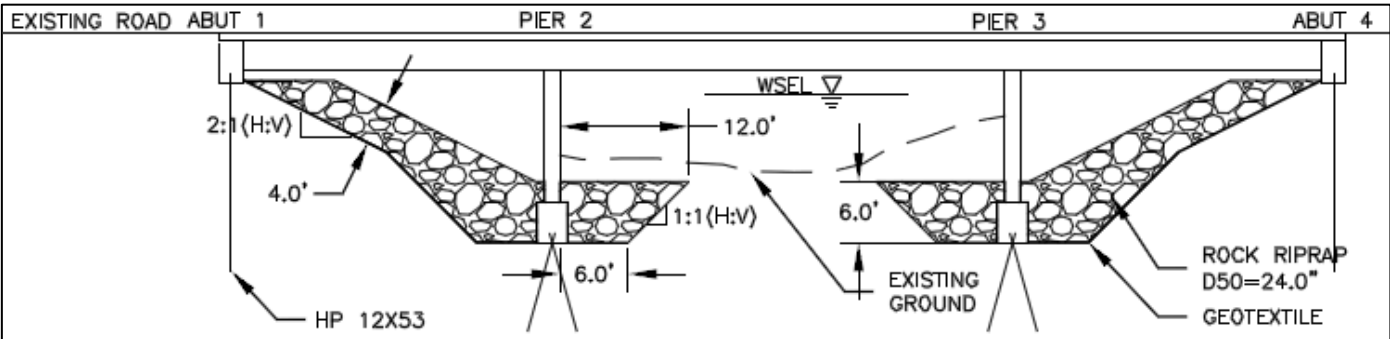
Cross-sectional view of Bridge C-09-AR with recommended hydraulic scour countermeasures
